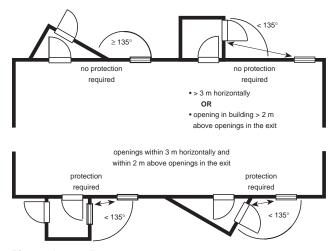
Protection of openings in exterior walls of exits
